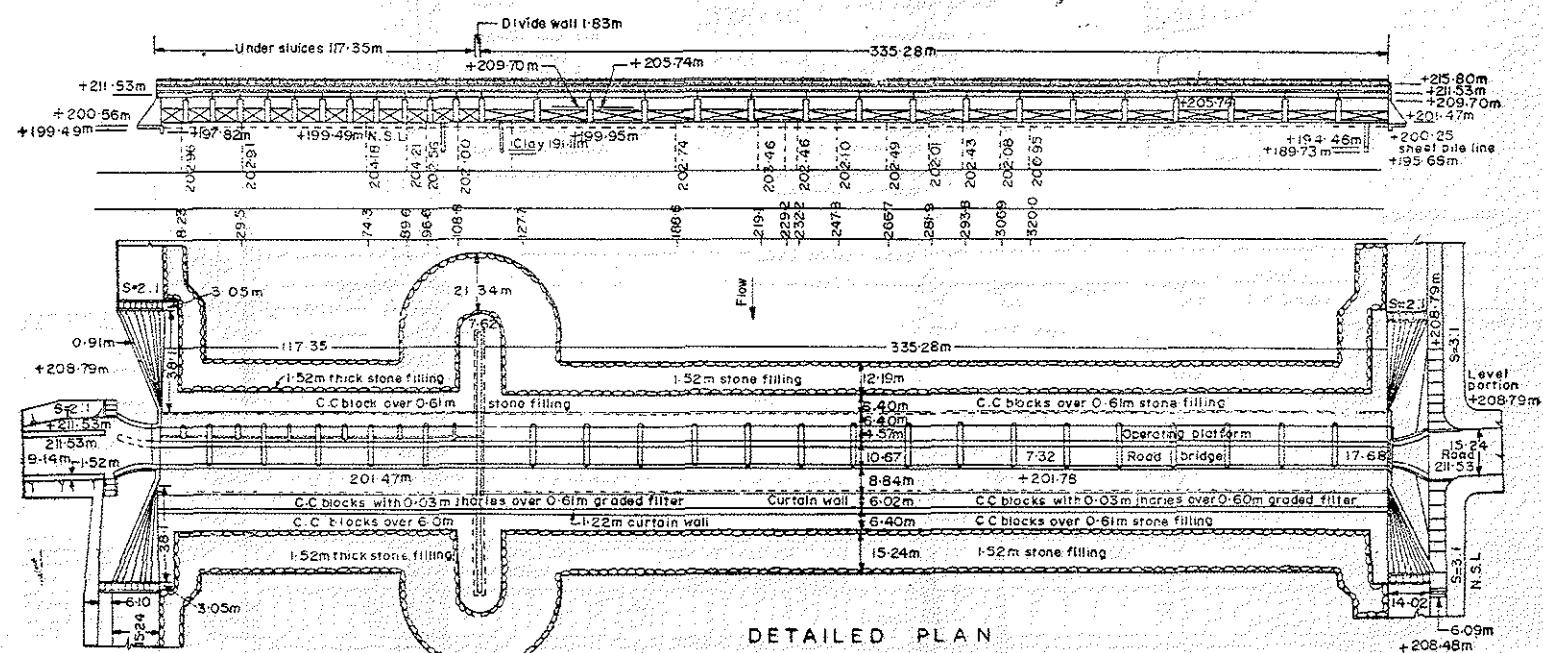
Wazirabad Barrage detailed Layout Plan.
